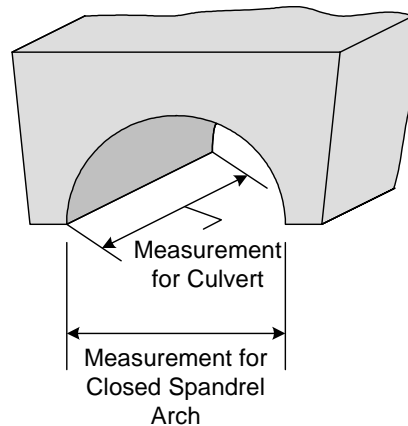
Measurements for Closed Spandrel Arches and Arch Culverts
